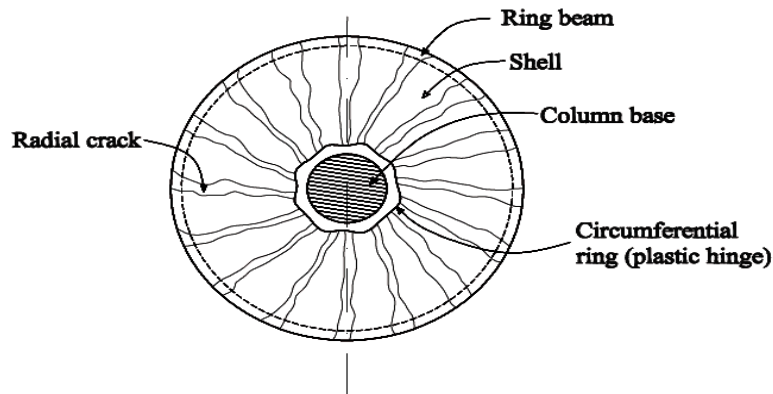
Mechanism of Failure of Conical Footing (Kurian,2006)
